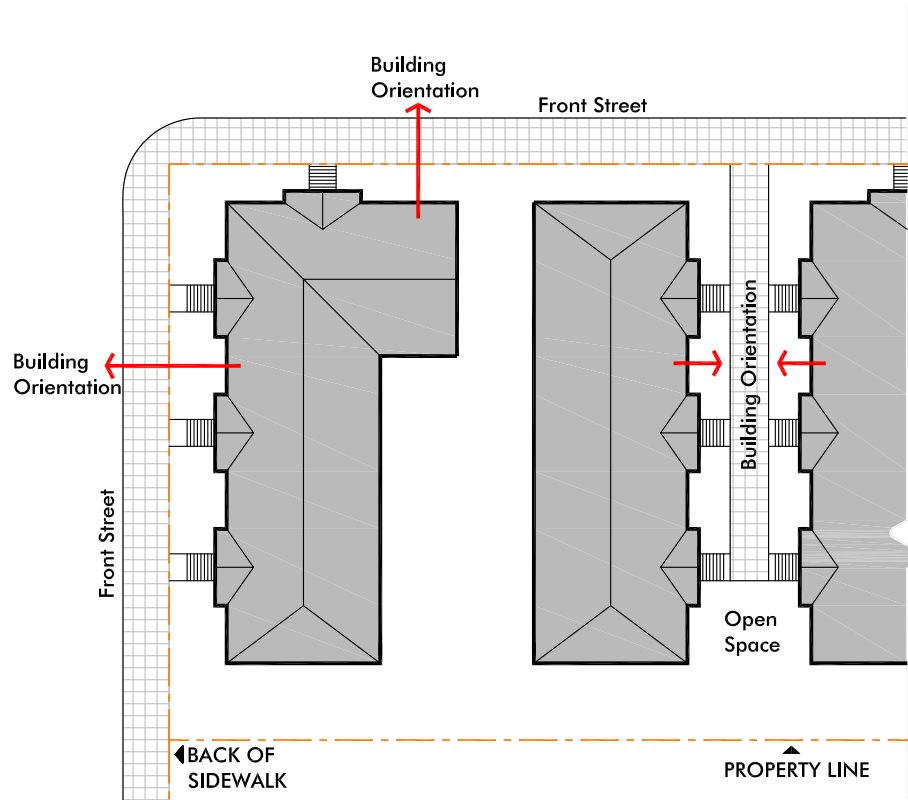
BUILDING ORIENTATION TO STREETS AND PUBLIC OPEN SPACES
